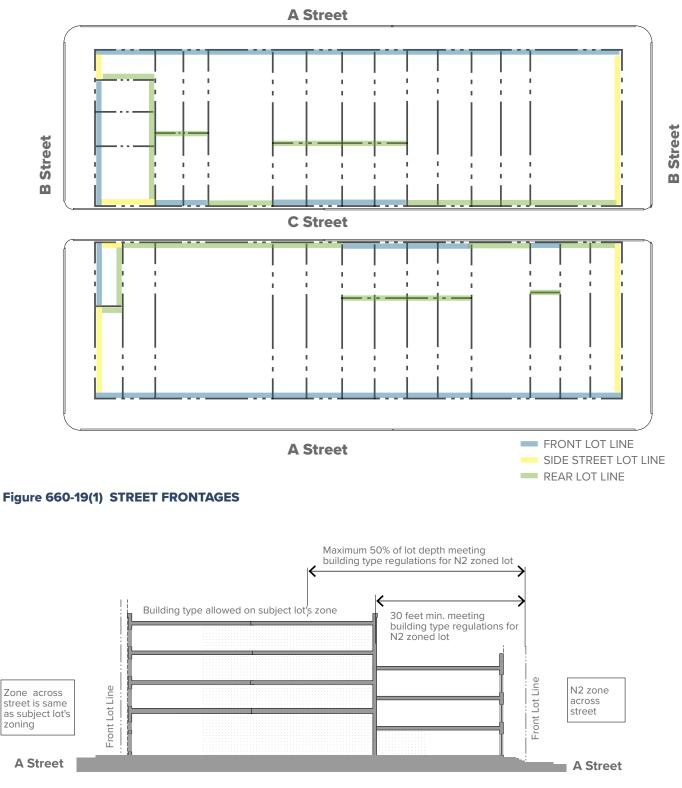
(2) Example of a Double-Frontage Lot (building section)
